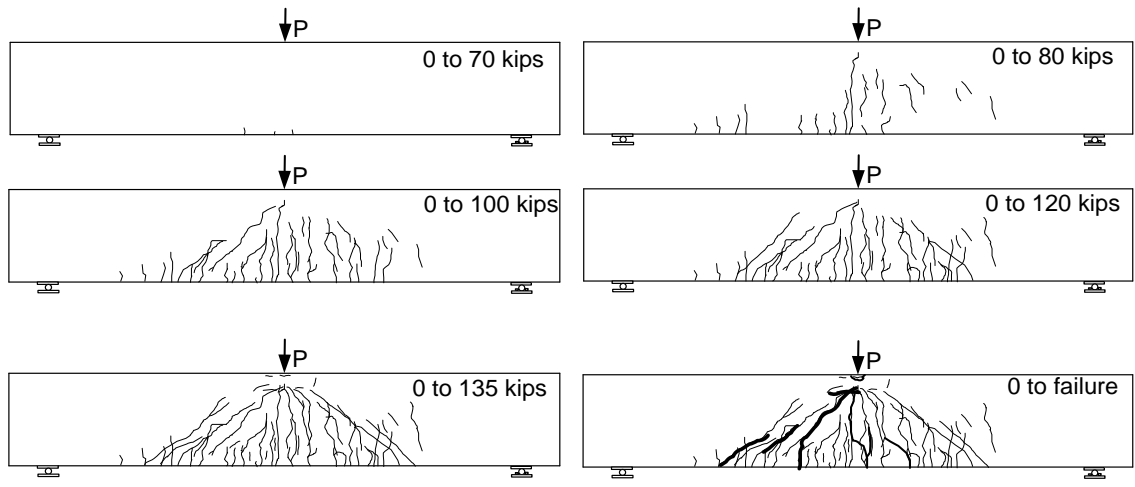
Crack Pattern of SFRPC#2-2 Specimen at Different Stages of Loading
